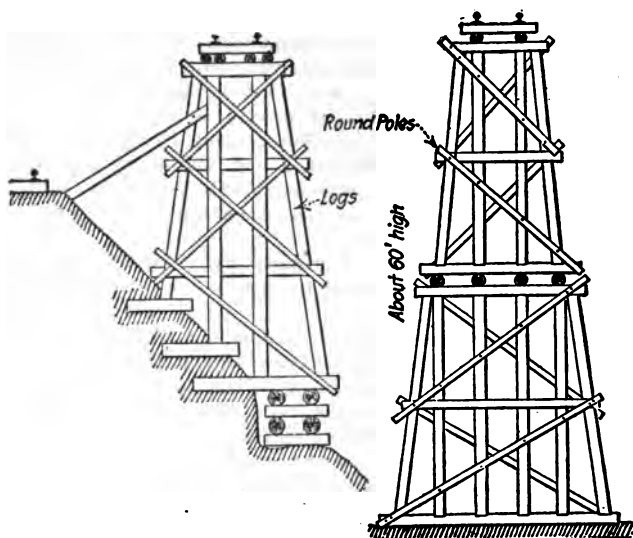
Trestle Built on Slope of Old 70-Ft. Fill. Two-Story Trestle.
